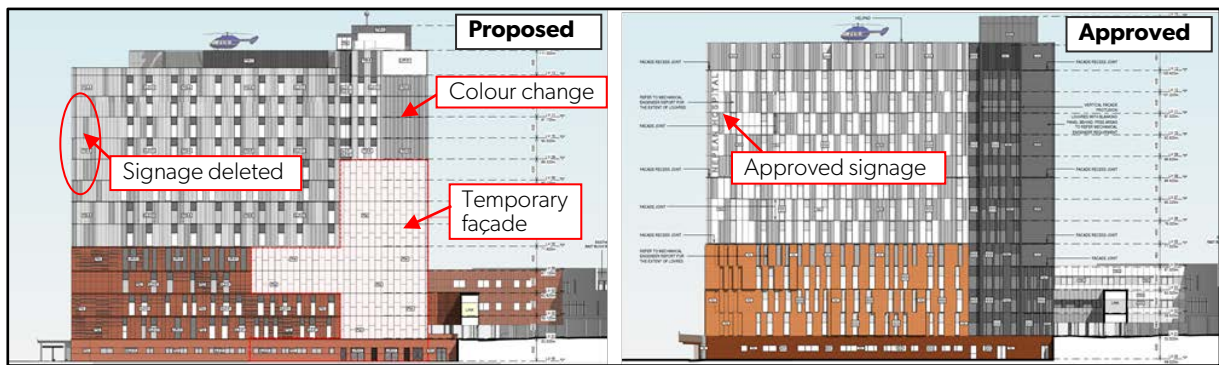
| Proposed (left) and Approved (right) Western Elevation (Source: Modification Application and Approved Plans)
